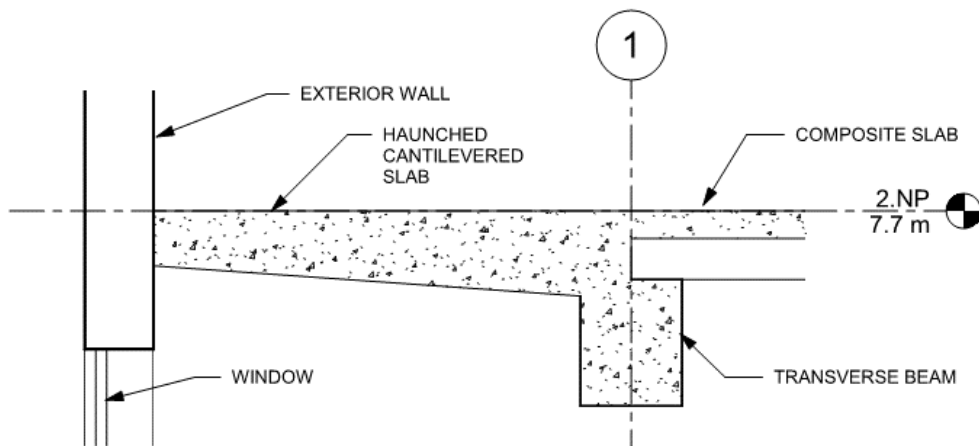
Revit detail of cantilevered area on north side of Level 2NP
